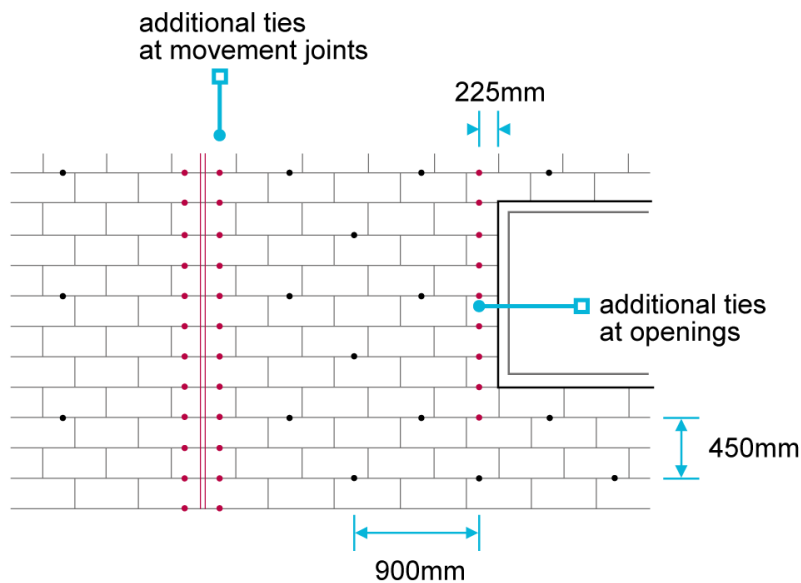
Typical Wall tie detail (Ref NHBC Standard 6.1.18)
